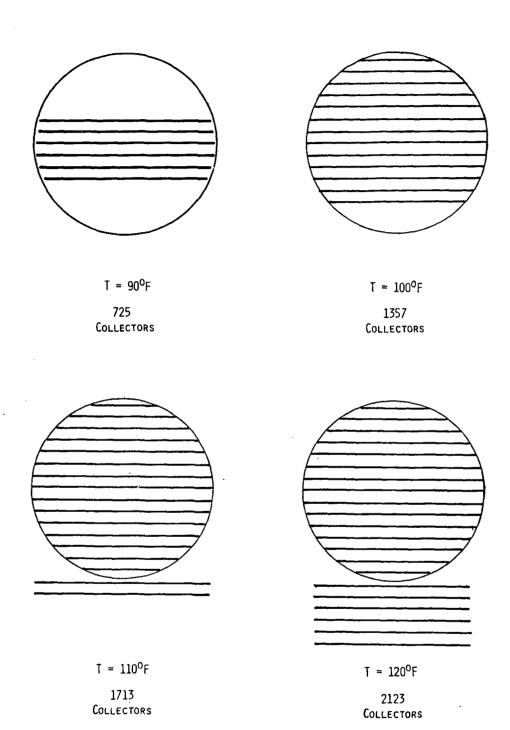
ACTIVE COLLECTOR ARRAY LAYOUT PORTLAND, MAINE; PLAN VIEW
